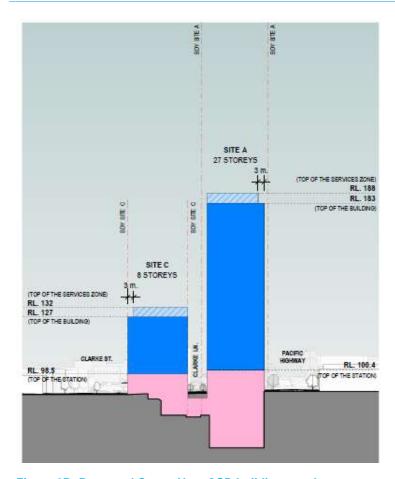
B: Proposed Crows Nest OSD building envelopes – cross section through the site (east-west)
